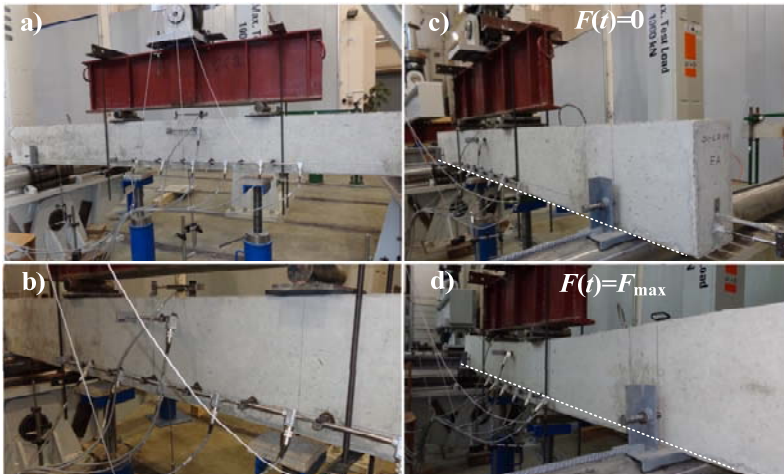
Arrangement of the instrumentation: a) before the test; b) arrangement of linear voltage displacement transducers in the pure bending zone; c) beam specimen prepared before the test; d) beam specimen during load cycling
